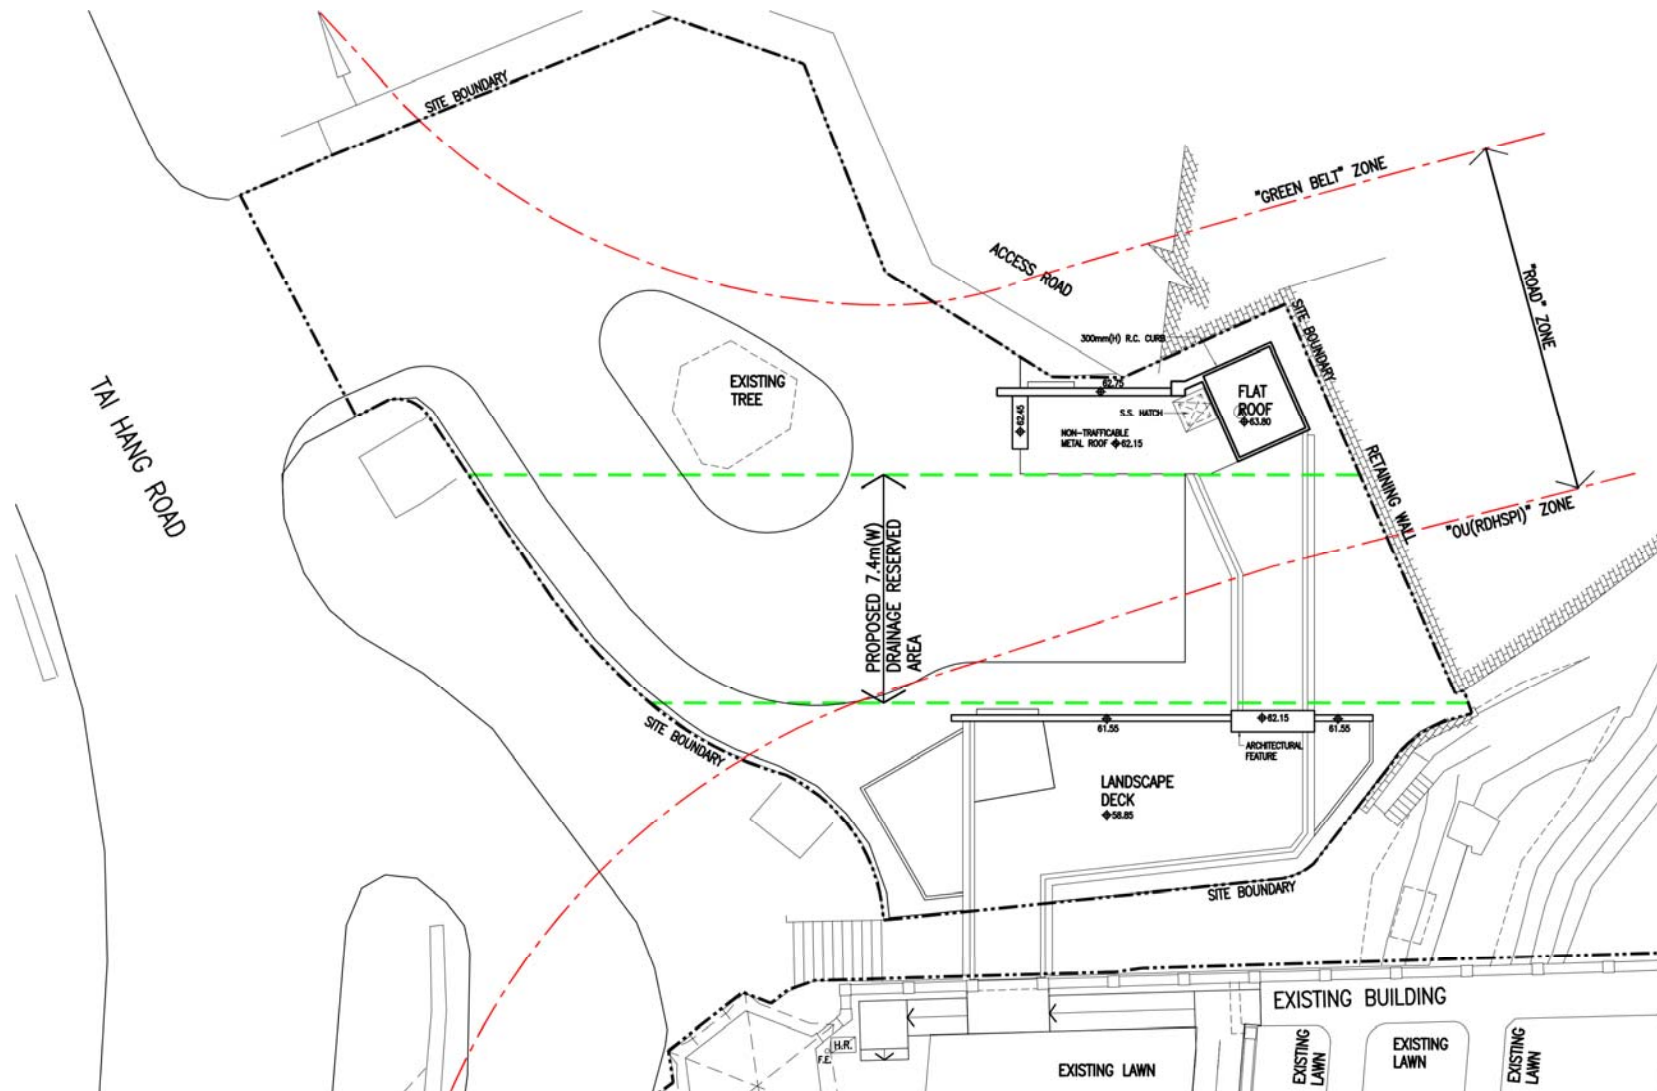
Proposed Upper Roof Plan of the Ancillary Site (not to scale)
